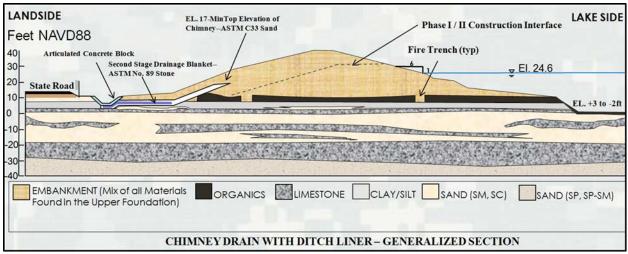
Generalized section chimney, blanket, and ditch lining
